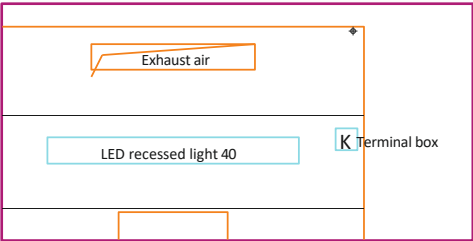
Detail of a CAD drawing of a kitchen hood roof with terminal box marked.
